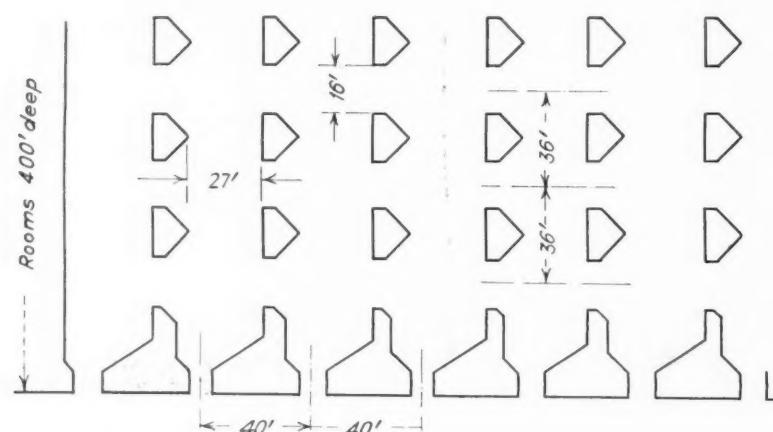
Room-working plan at the new Hart No. 7 mine.
